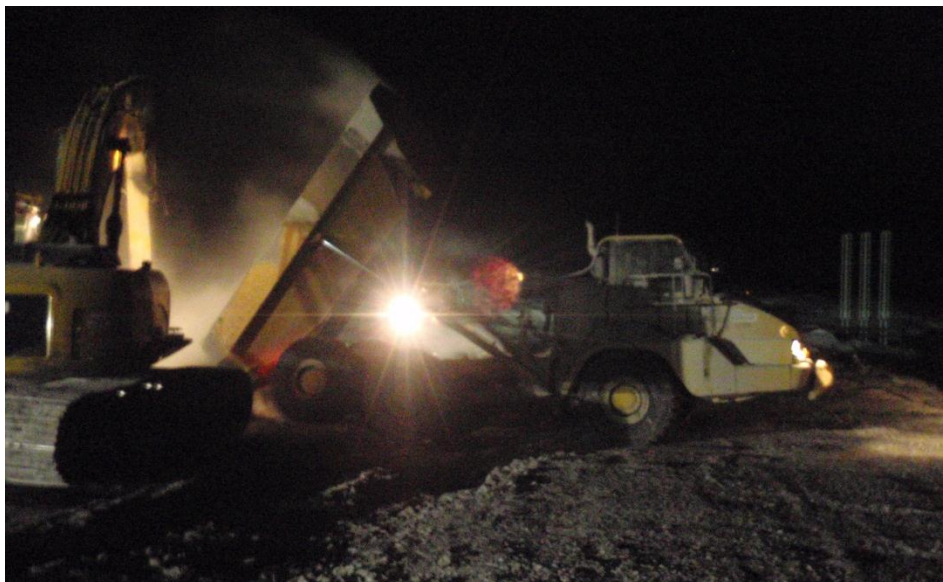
730 dumping load of FCM around 0+75 for the excavator.
